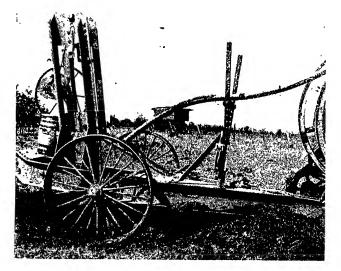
CABLE LAYING PLOW—IMPROVED DESIGN
